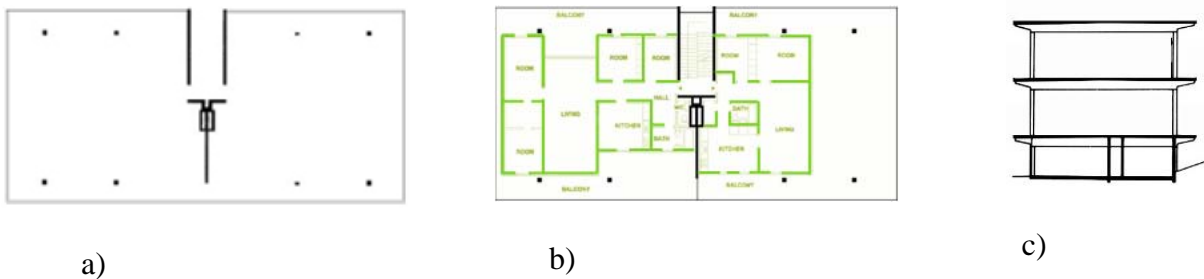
Kallebäck Building Model: a) Load-bearing structure; b) interior partitions of space; c)
